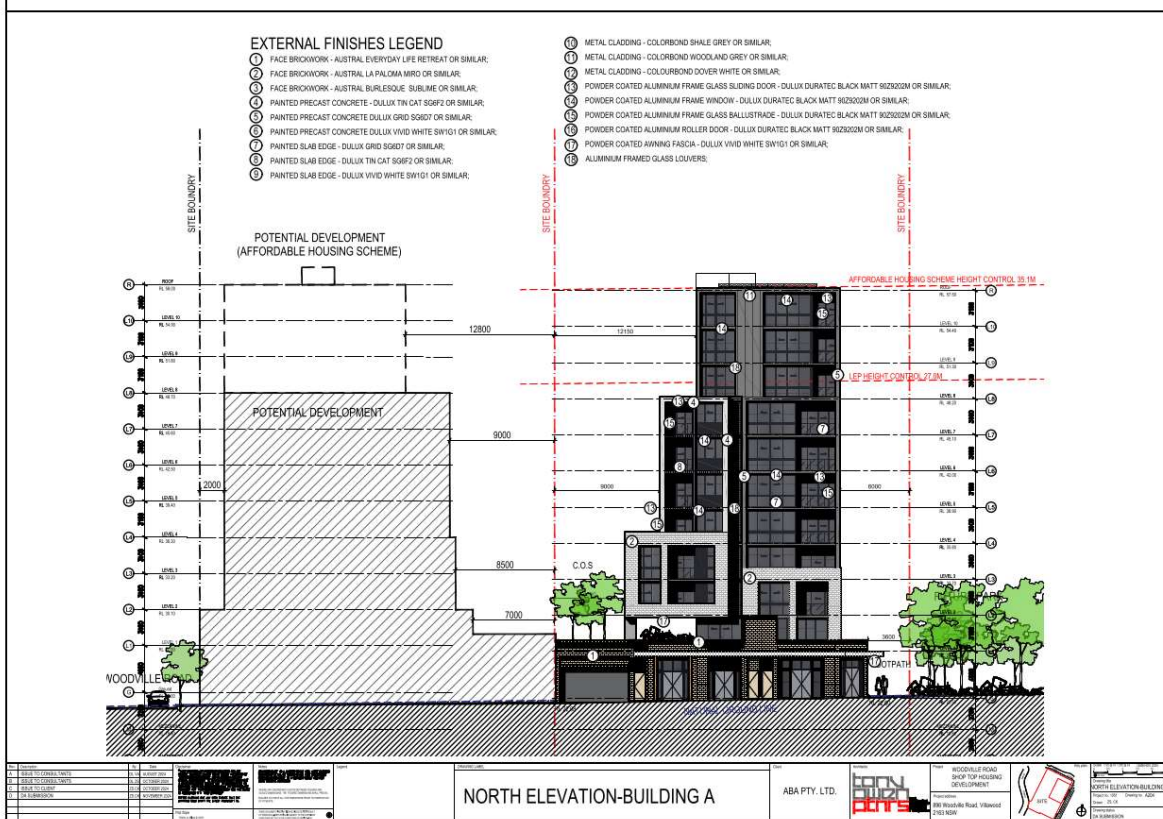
Proposed North Elevation of Buildings A facing Hilwa Street and including a concept illustrating how the neighbouring service station can be developed in future.
